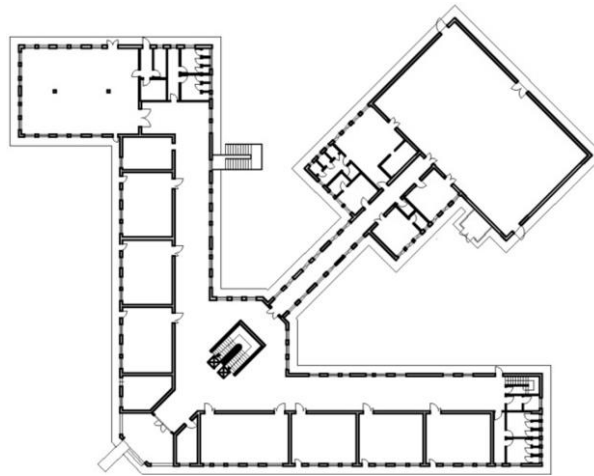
“Alberto Manzi” Comprehensive school built in Grosseto in 1981 (by kind permission of Comune di Grosseto). A return to the "finger plan" model can be observed, with the classroom as the basic space unit.
